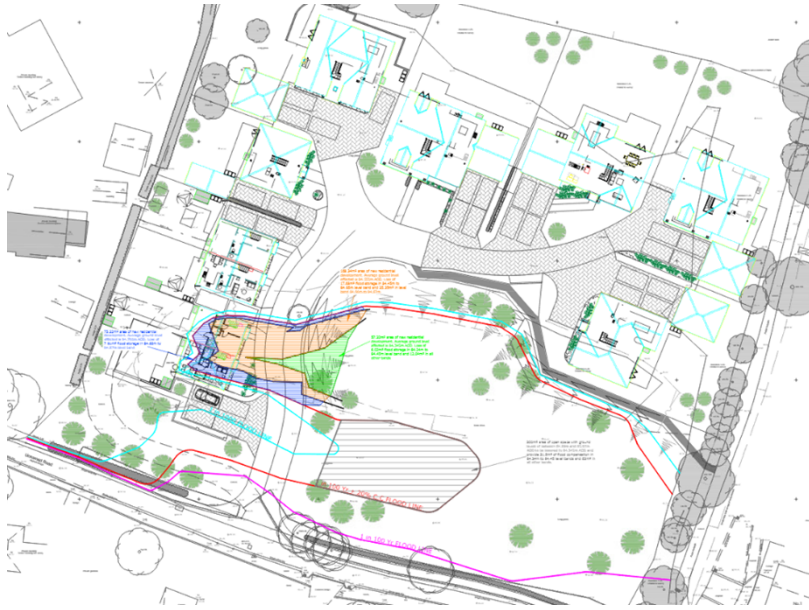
Site Survey and Modelled Flood Lines overlaid onto Proposed Site Plan.
